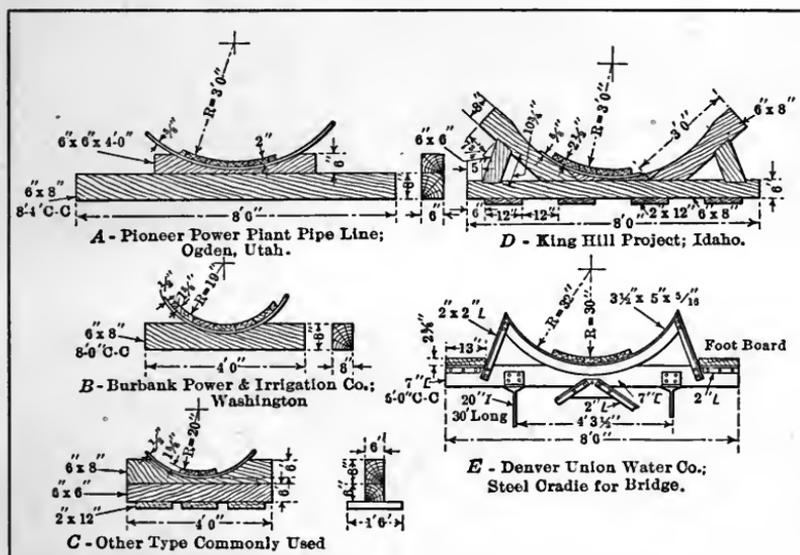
Supporting sills and cradles for wood stave pipe.
